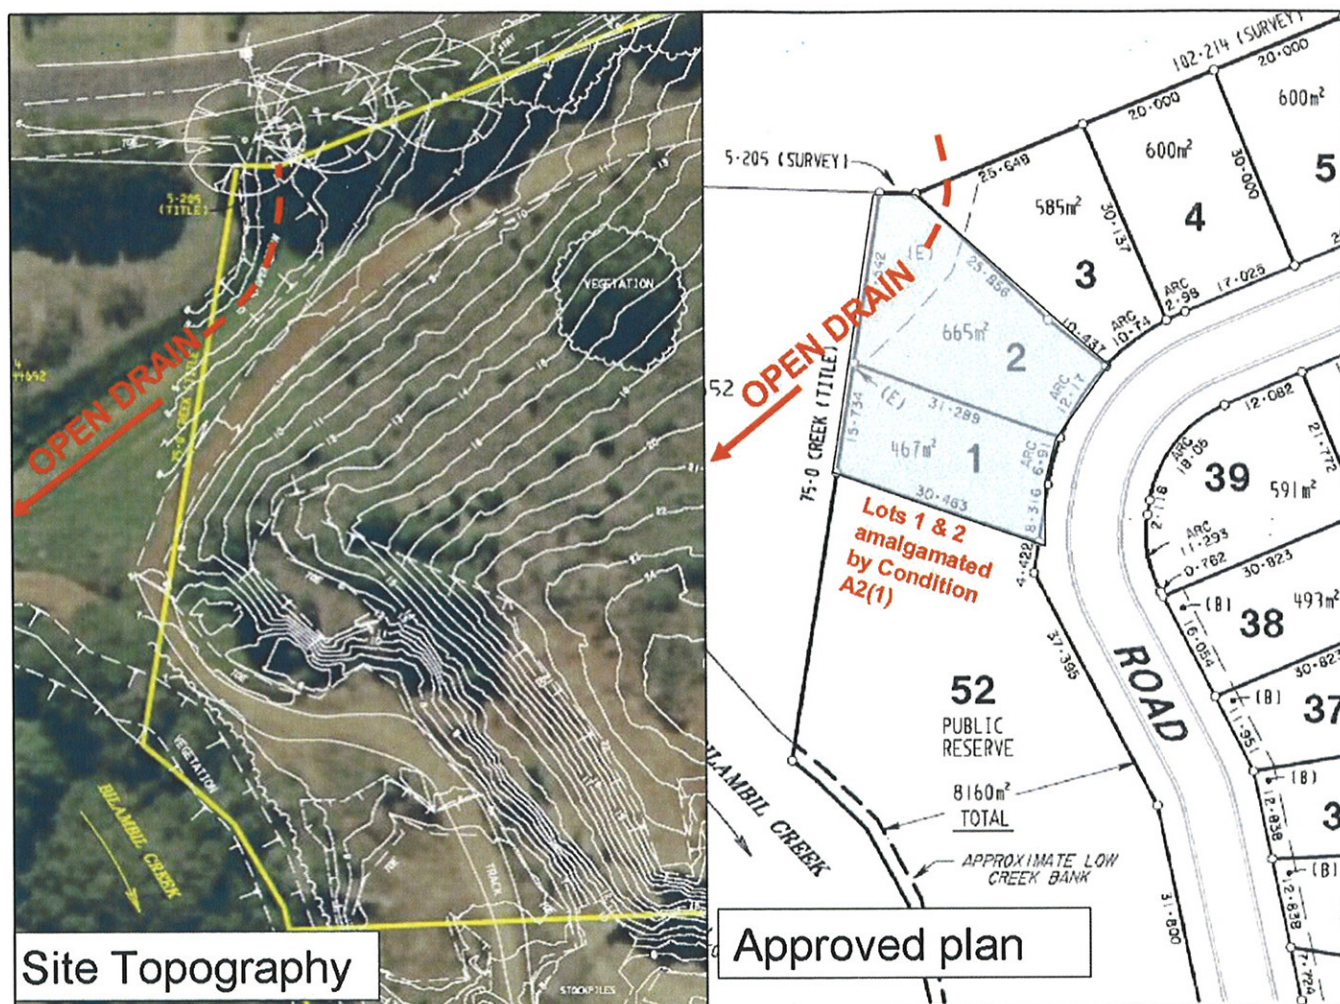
Close up view of the north-west part of the site subject to modification request. Approved subdivision layout in the north-west corner is shown on the right hand side (RHS). Site topography and aerial photograph is shown on left hand side (LHS).
